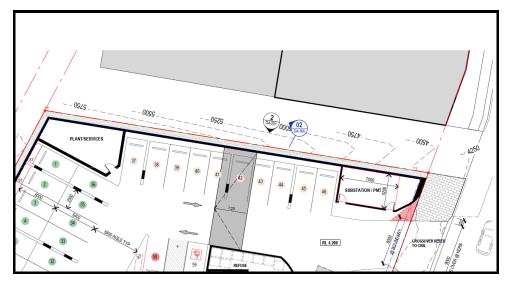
Proposed ground level setback to the northern adjoining site (Source: Jackson Teece, June 2022)
